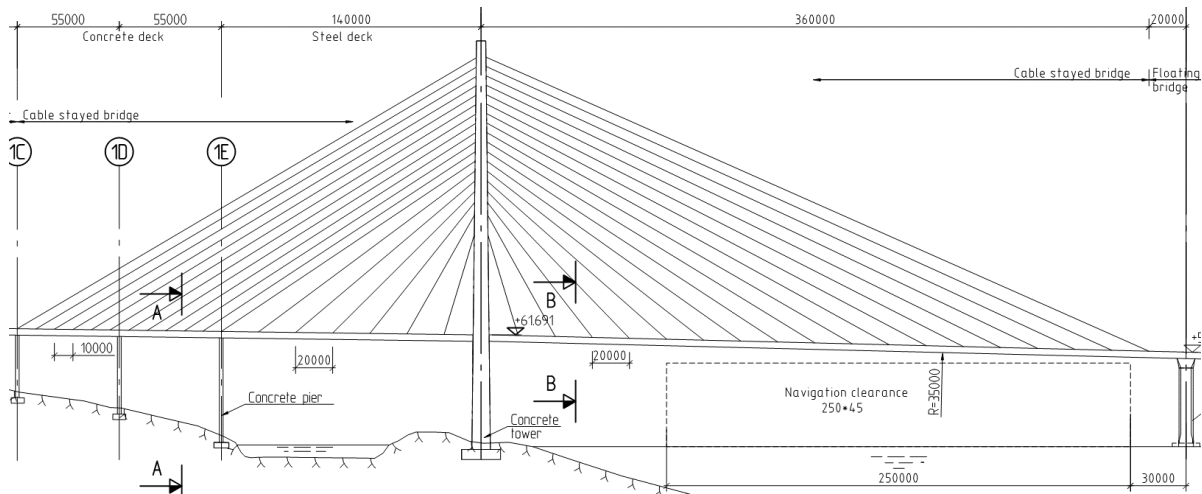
Cable stayed bridge of the Bjørnafjorden K12 alternative.
